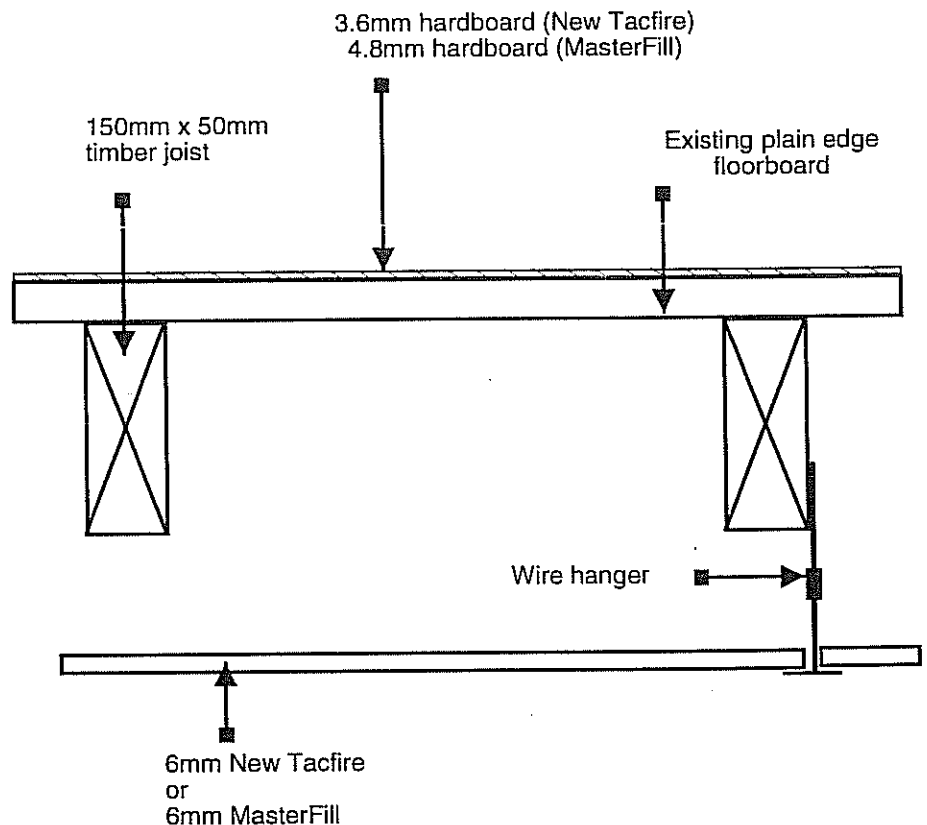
Use of New Tacfire or MasterFill to provide a suspended ceiling of 30 minutes fire resistance
